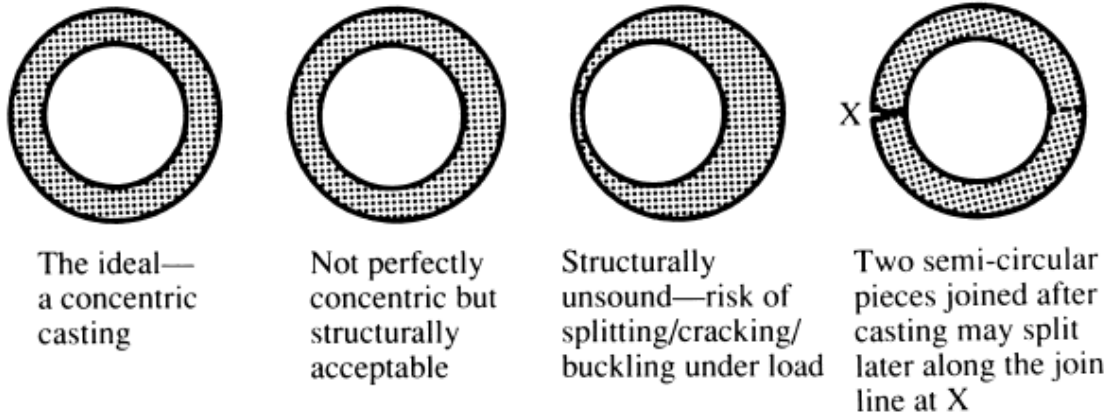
Cross-sections of hollow cast iron columns, showing possible degrees of imperfection (from Blanchard et al., 1982).
